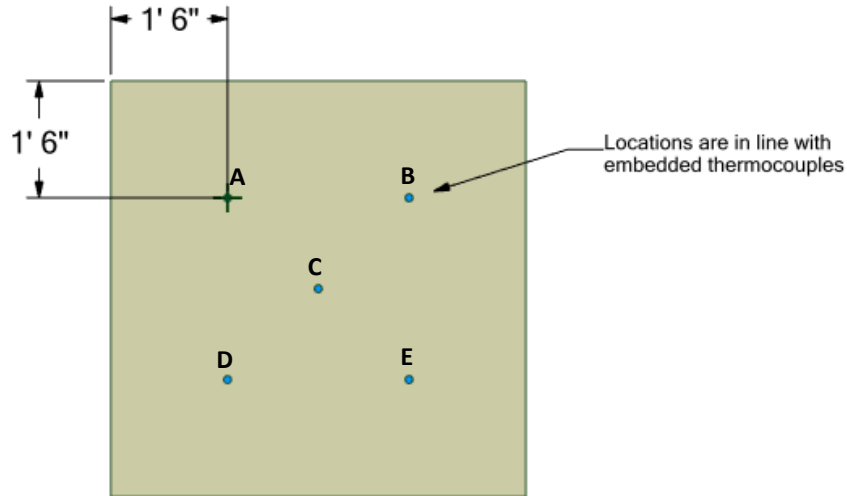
Formed concrete wall: Location of TC stations comprised of surface and embedded TCs. Surface shown is facing the heated shroud.
